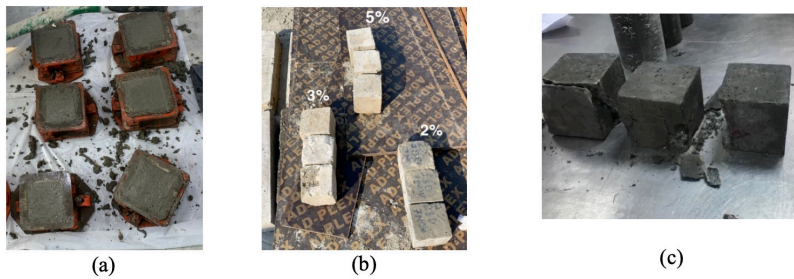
Concrete cube samples (a) after casting (b) after curing (c) after compressive test
